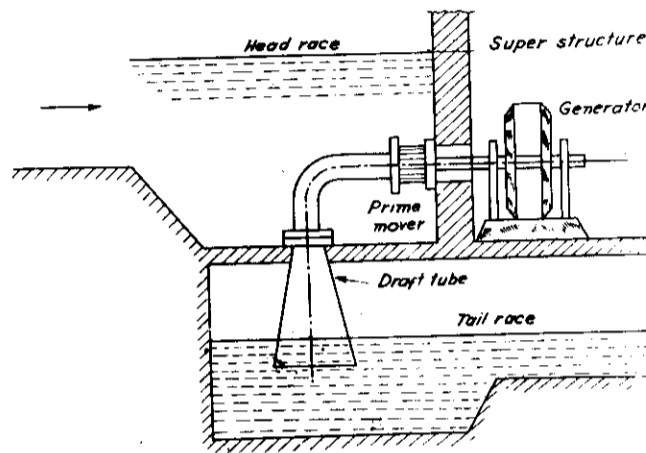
Open flume with horizontal setting of Francis Turbine.
